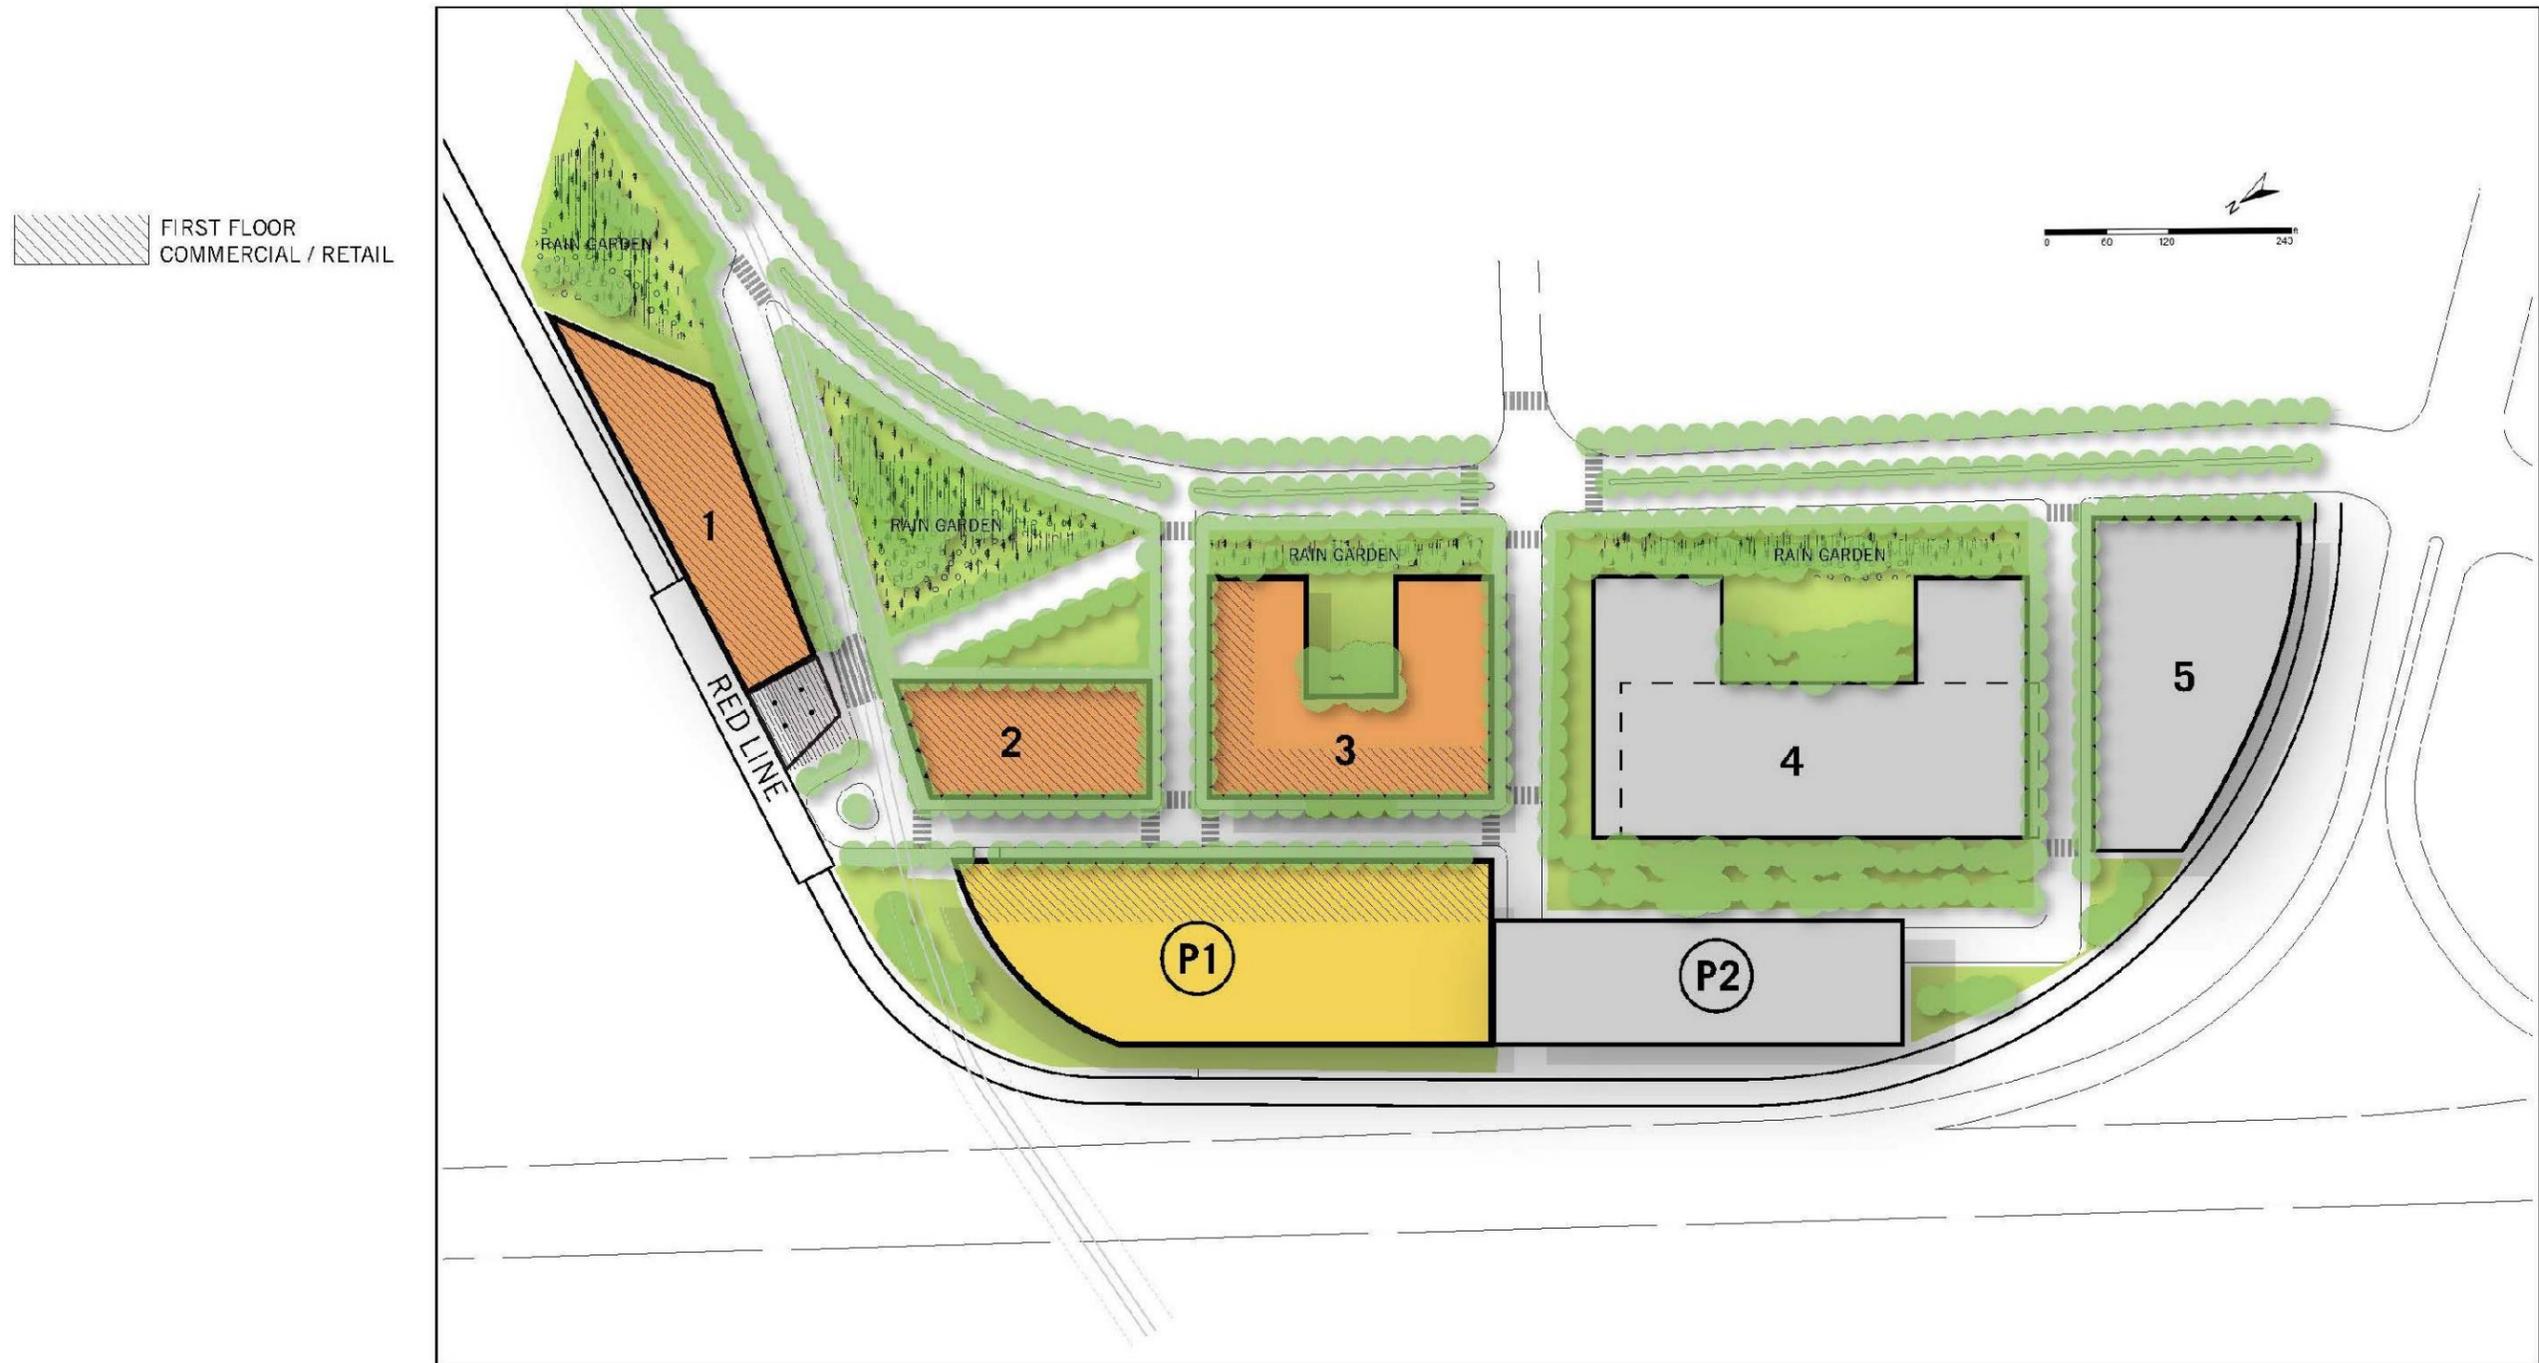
| Scenario 1: Parkway/Boulevard Conceptual Plan
